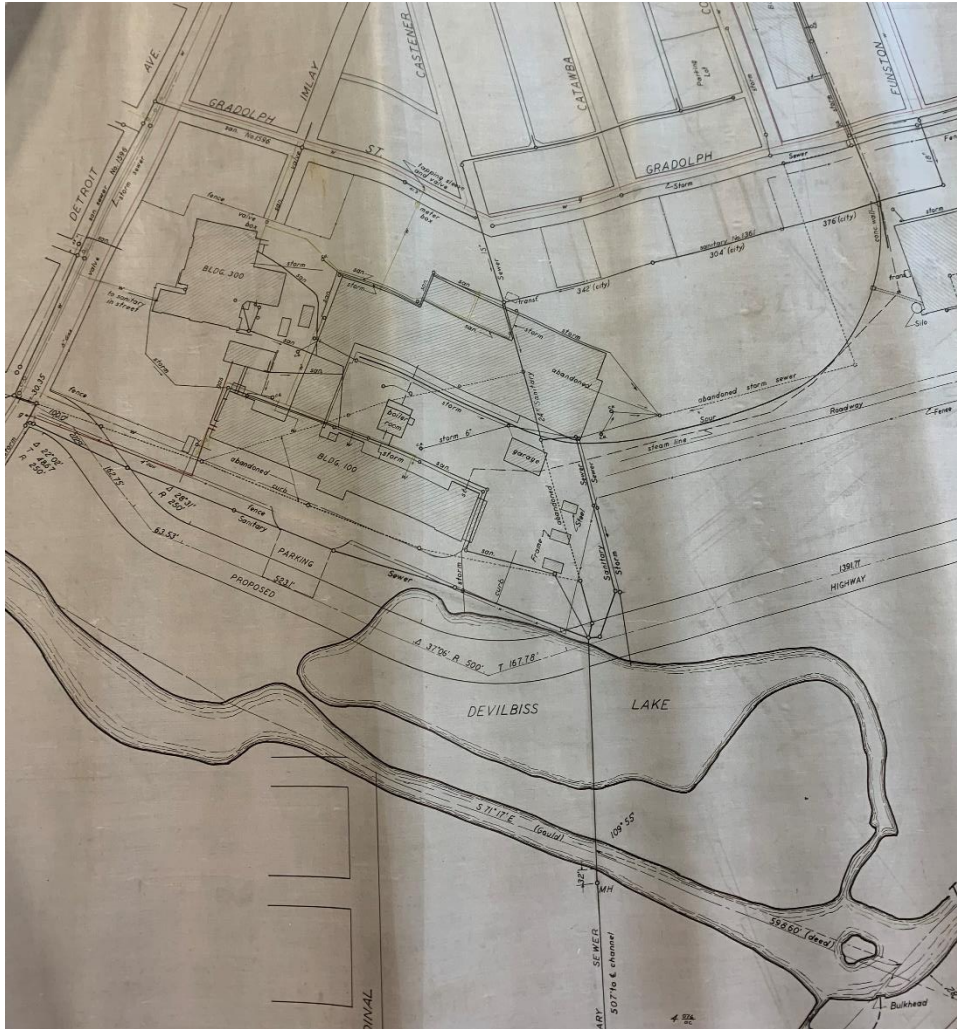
1948 Civil Engineering Drawings, Lewandowski Engineers
